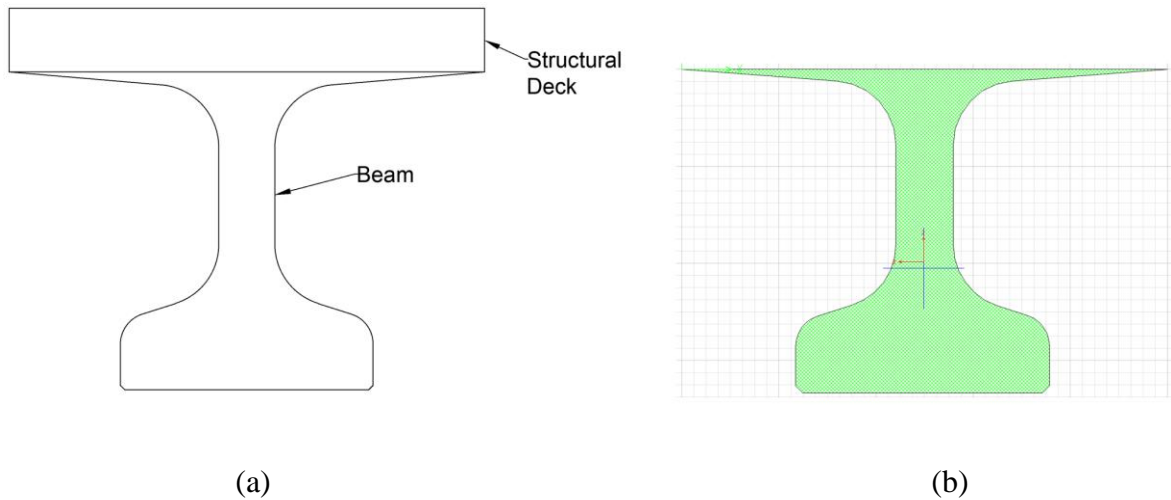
(a) Bridge structural deck and beam (b) beam cross-section in CSiBridge
